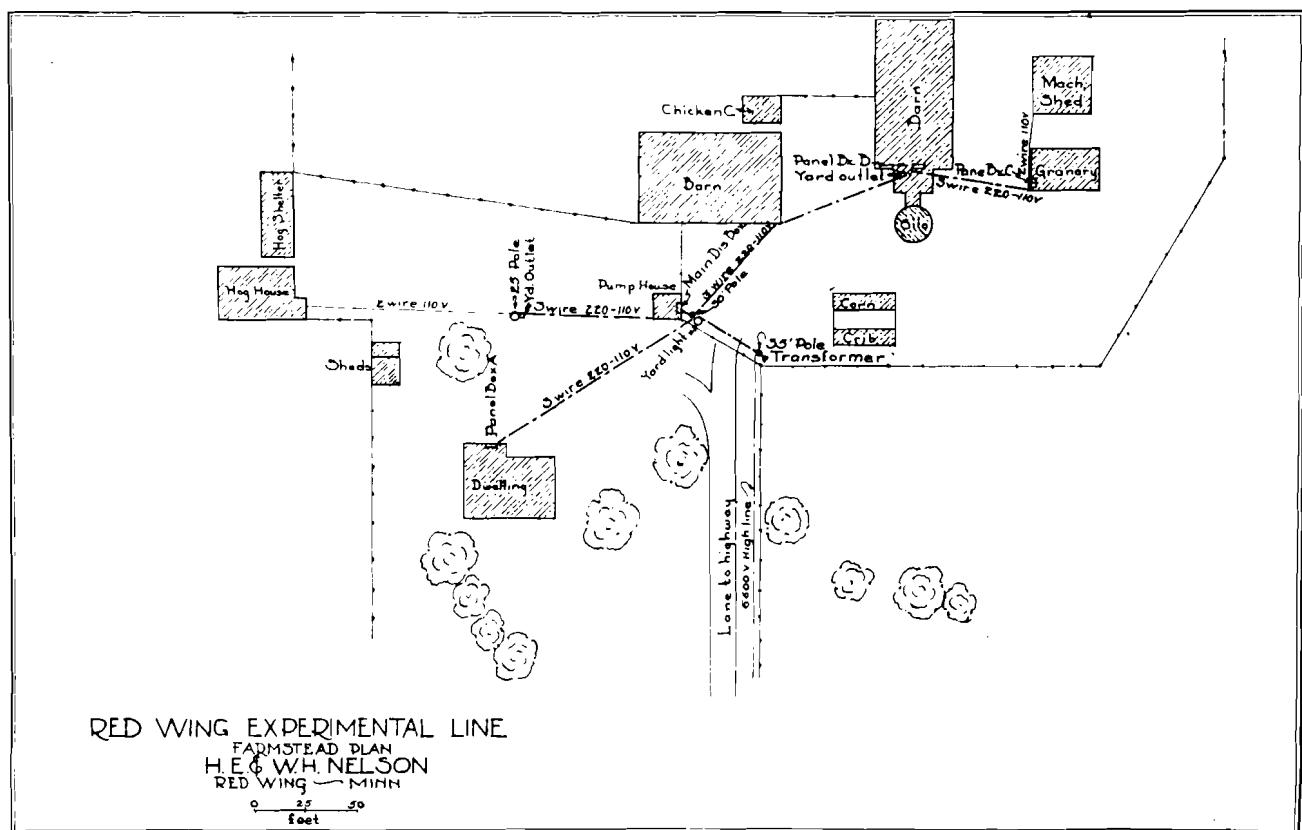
Revised wiring plan, H. E. and W. H. Nelson farm. Transformer in yard, near pump house, shortens secondary runs to house and barns.
